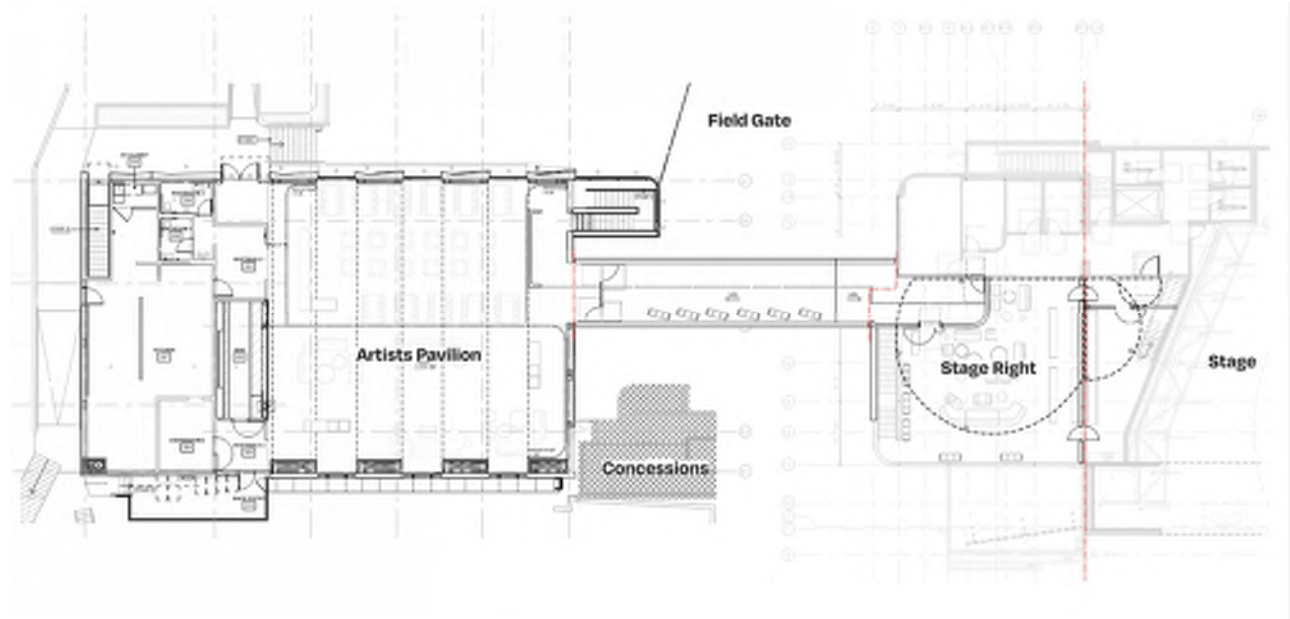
Site Plan Proposed Artists Pavilion, Bridge and Stage Right Terrace – close up view
